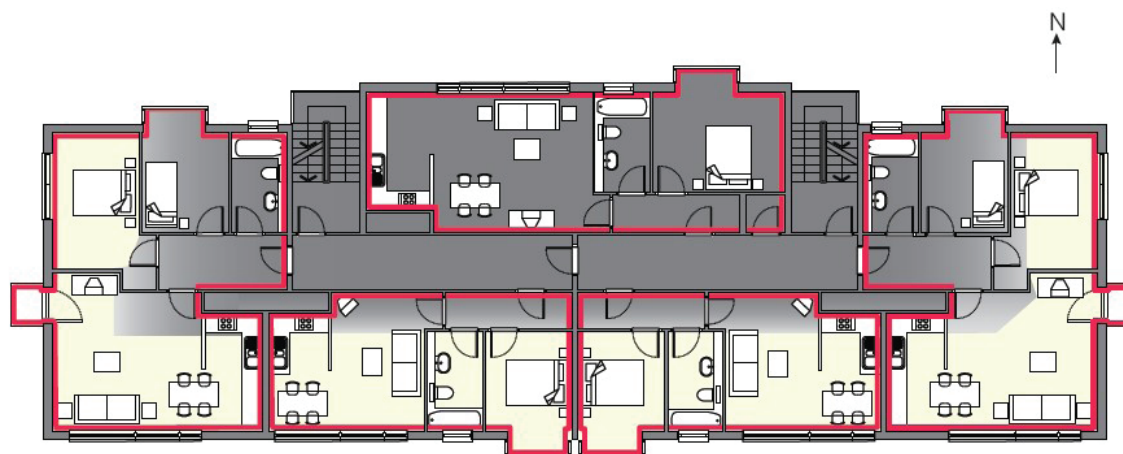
Careful layout design means that four out of the five flats shown have a south-facing living room
